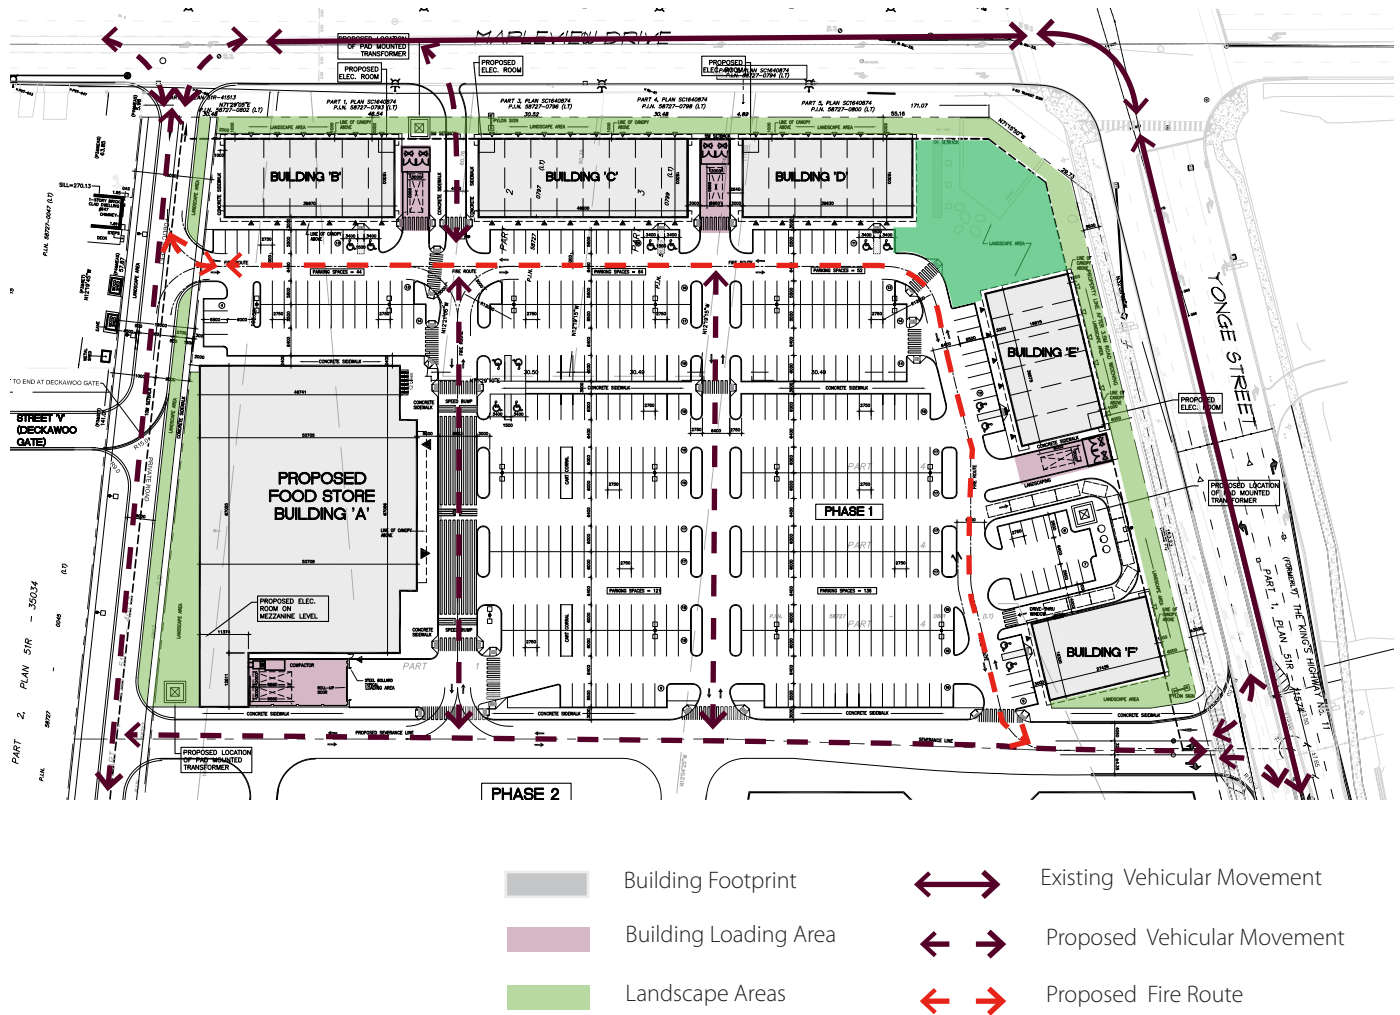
Site Plan showing vehicular movement and servicing and loading areas
